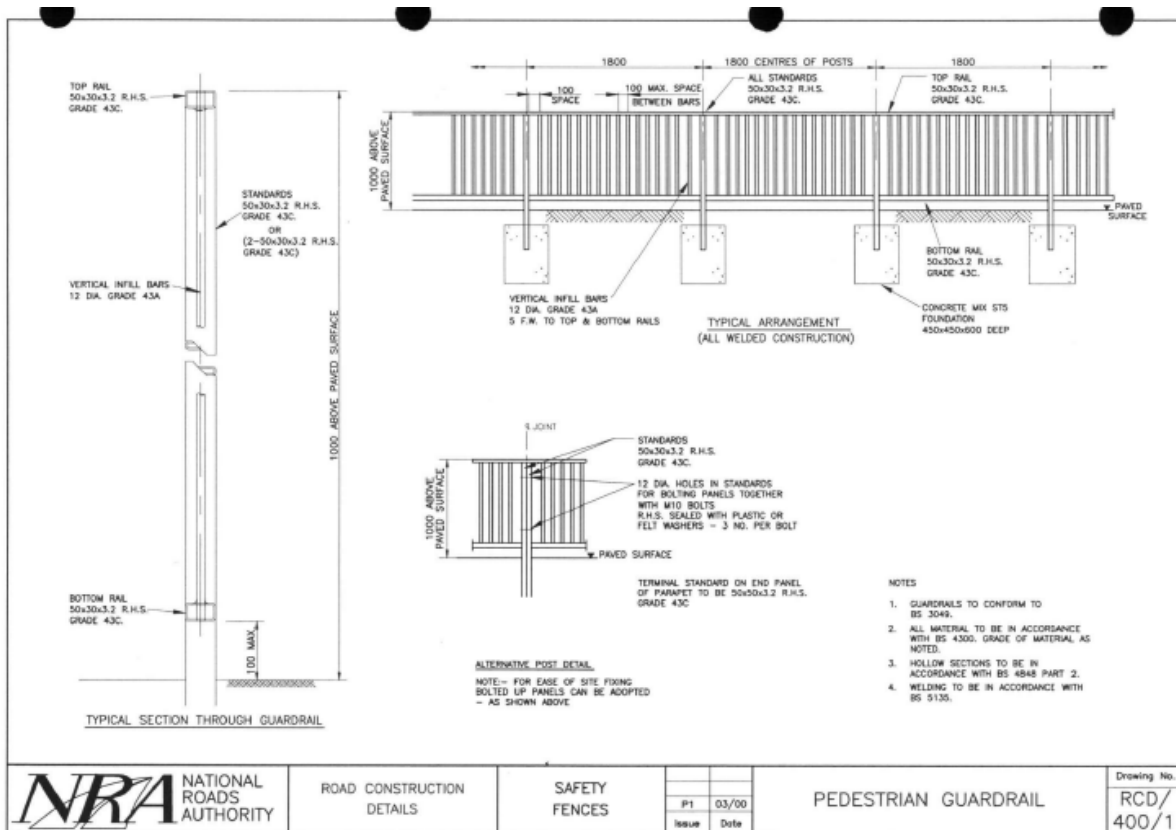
Bridge parapet details (note parapet to be a minimum of 1.4m high)
